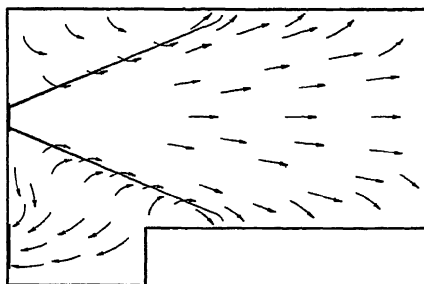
PLAN VIEW CORRECTLY LOCATED RETURN OUTLET ELIMINATING STAGNANT SPACE
